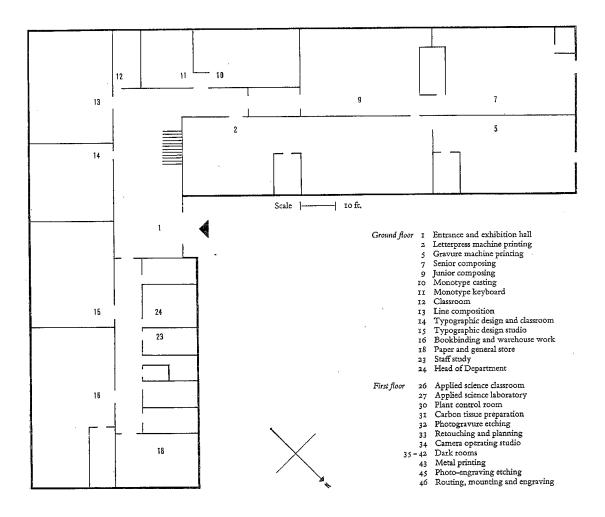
Ground Floor plan in 1961 (scale as shown)
